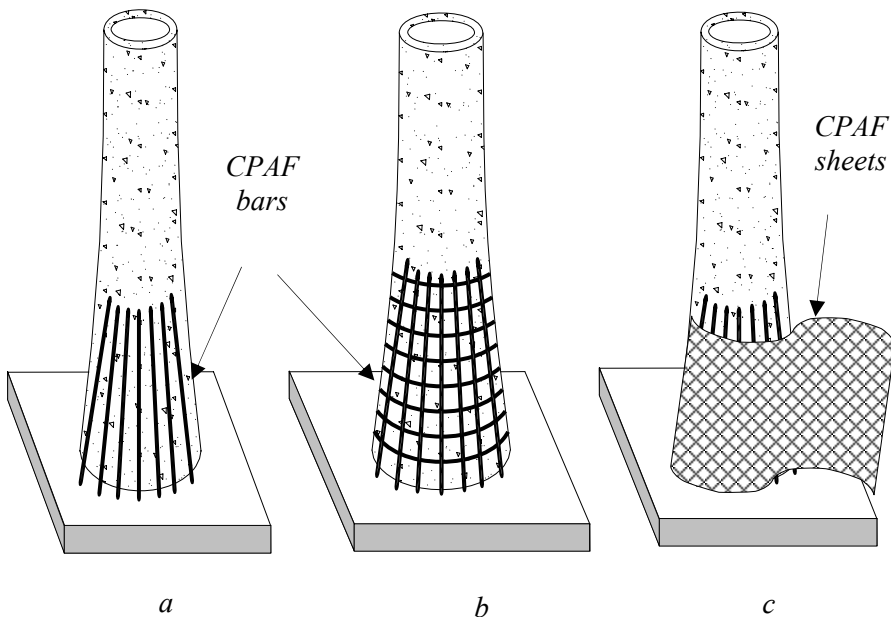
Strengthening of the reinforced concrete chimneys using: a) longitudinally mounted composite bars; b) composite bars arranged in longitudinal and transverse directions; c) confining with glass or carbon fabrics
